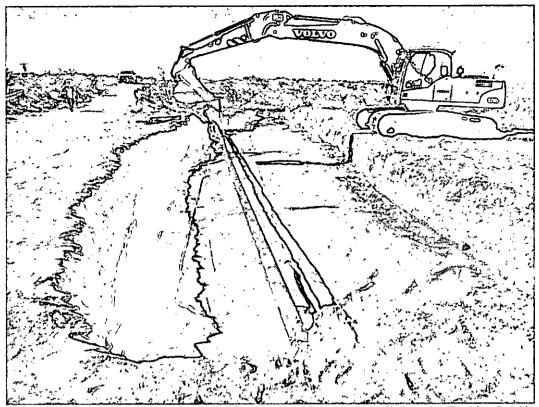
Photograph of the liner installation at the Tunstil #1286 Remediation Site (Looking South)
